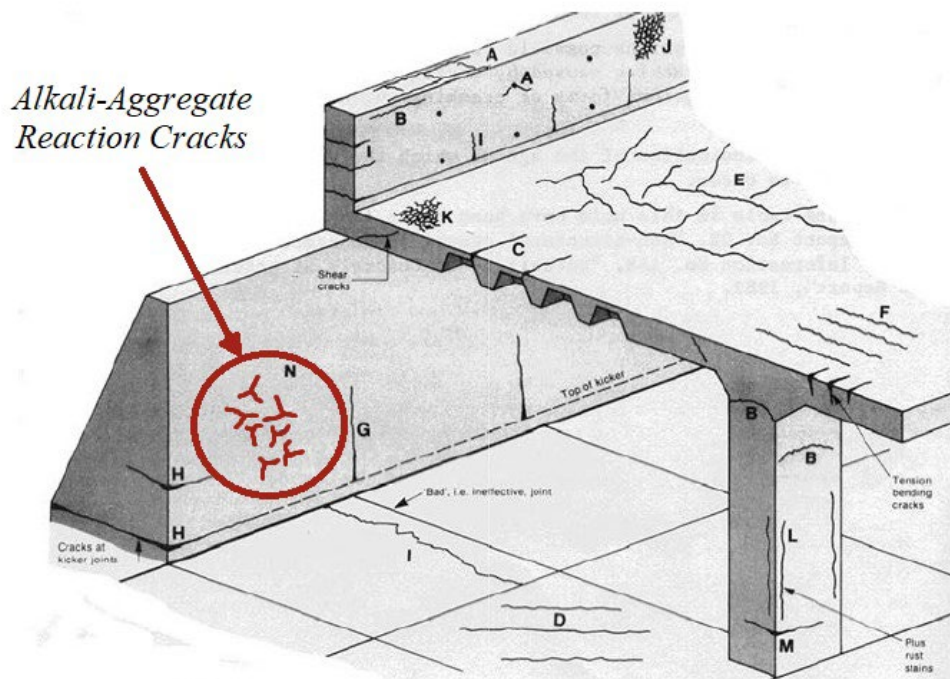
Typical cracks in reinforced concrete. (Courtesy of Beeby, 1983).
